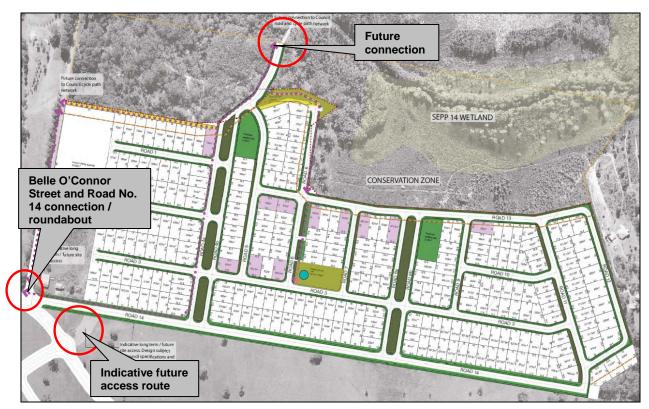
Indicative Future Access and Connection Routes (source: Preferred Project Report)
